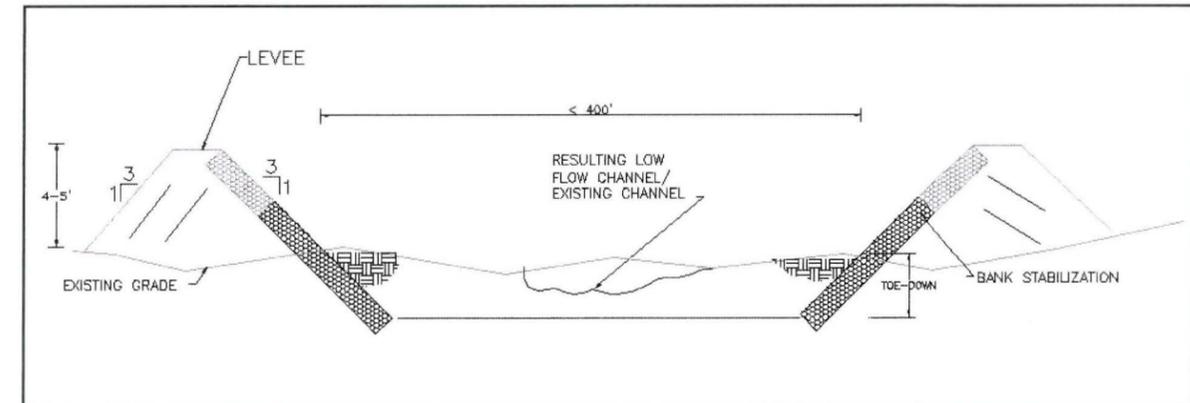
Concept Cross Section for Earthen Leveed Corridor (Alternatives A, B1, B2, B4, B5) (Not to scale)
